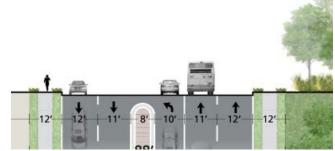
Typical section showing State Avenue existing right-of-way within mid-corridor section, Kansas City, KS
